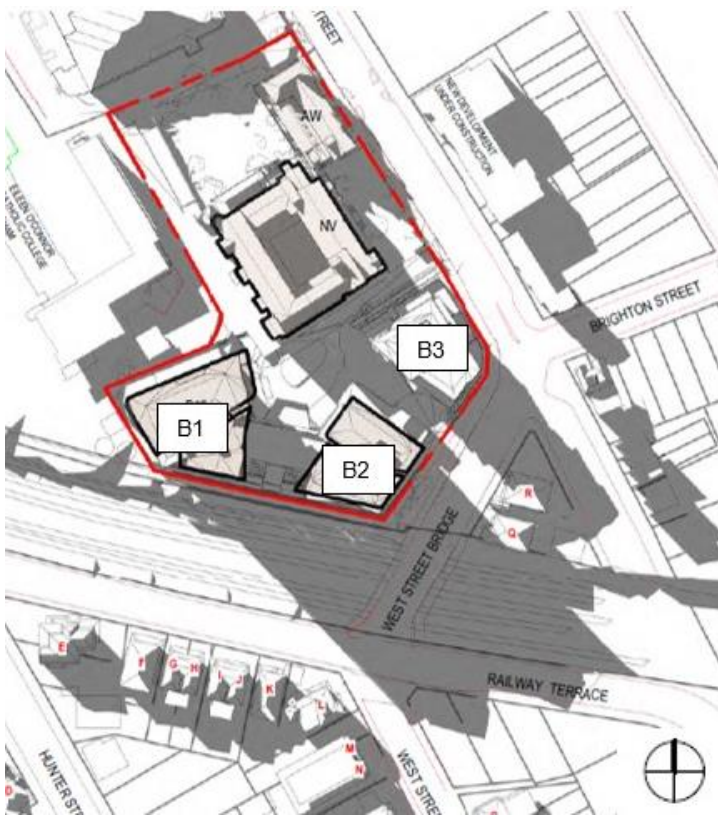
Shadow Diagram at 12pm on 21 June (Source: Jackson Teece Architectural Plans)
